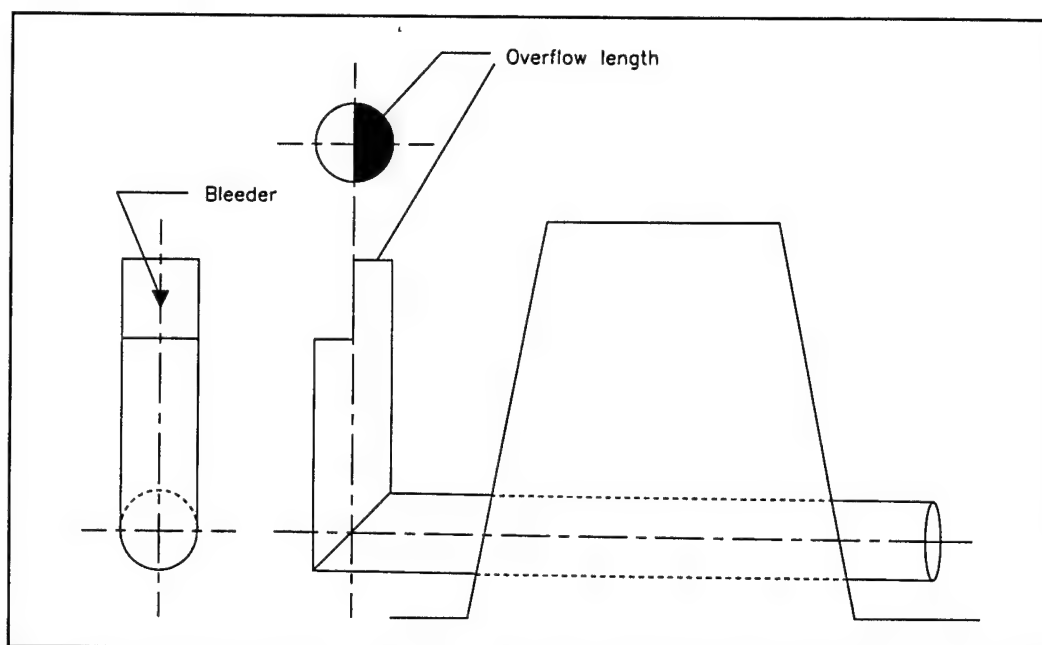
Riser pipe and culvert through an embankment. The riser pipe has a semi-circular overflow section and a bleeder on the upstream face.
